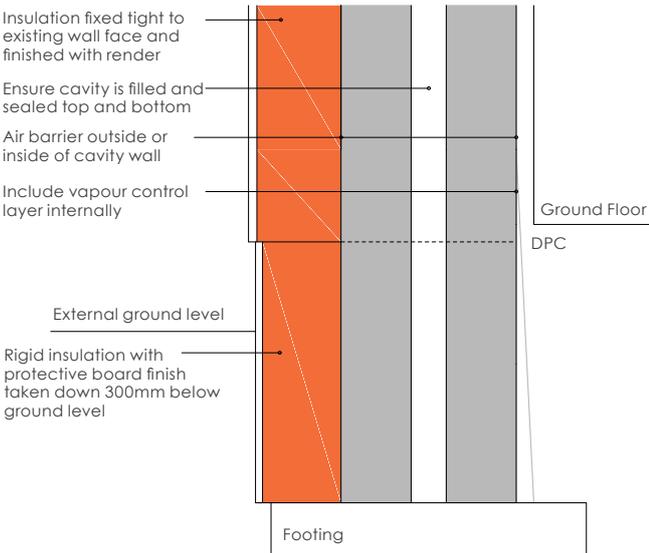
Insulation strategy for cavity wall - external wall insulation (EWI)
